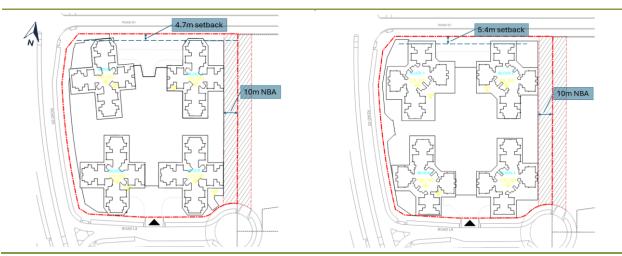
Master Layout Plan of Base Scheme (left) and Proposed Scheme (right) of Area 114
